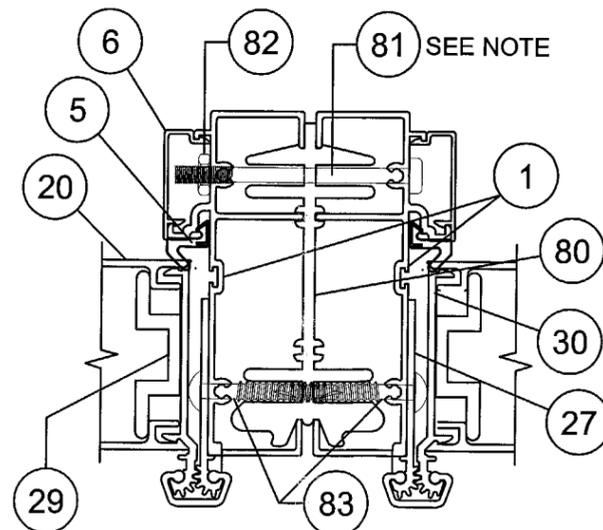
DETAIL F FULL JAMB SIDE LITE (AT HINGE JAMB)
